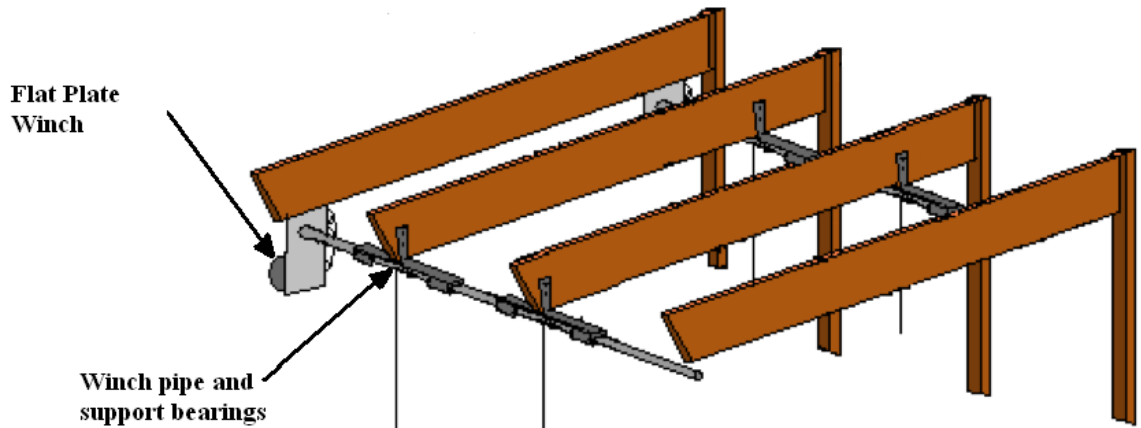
Example installation for flat plate winch and overhead hoist.
